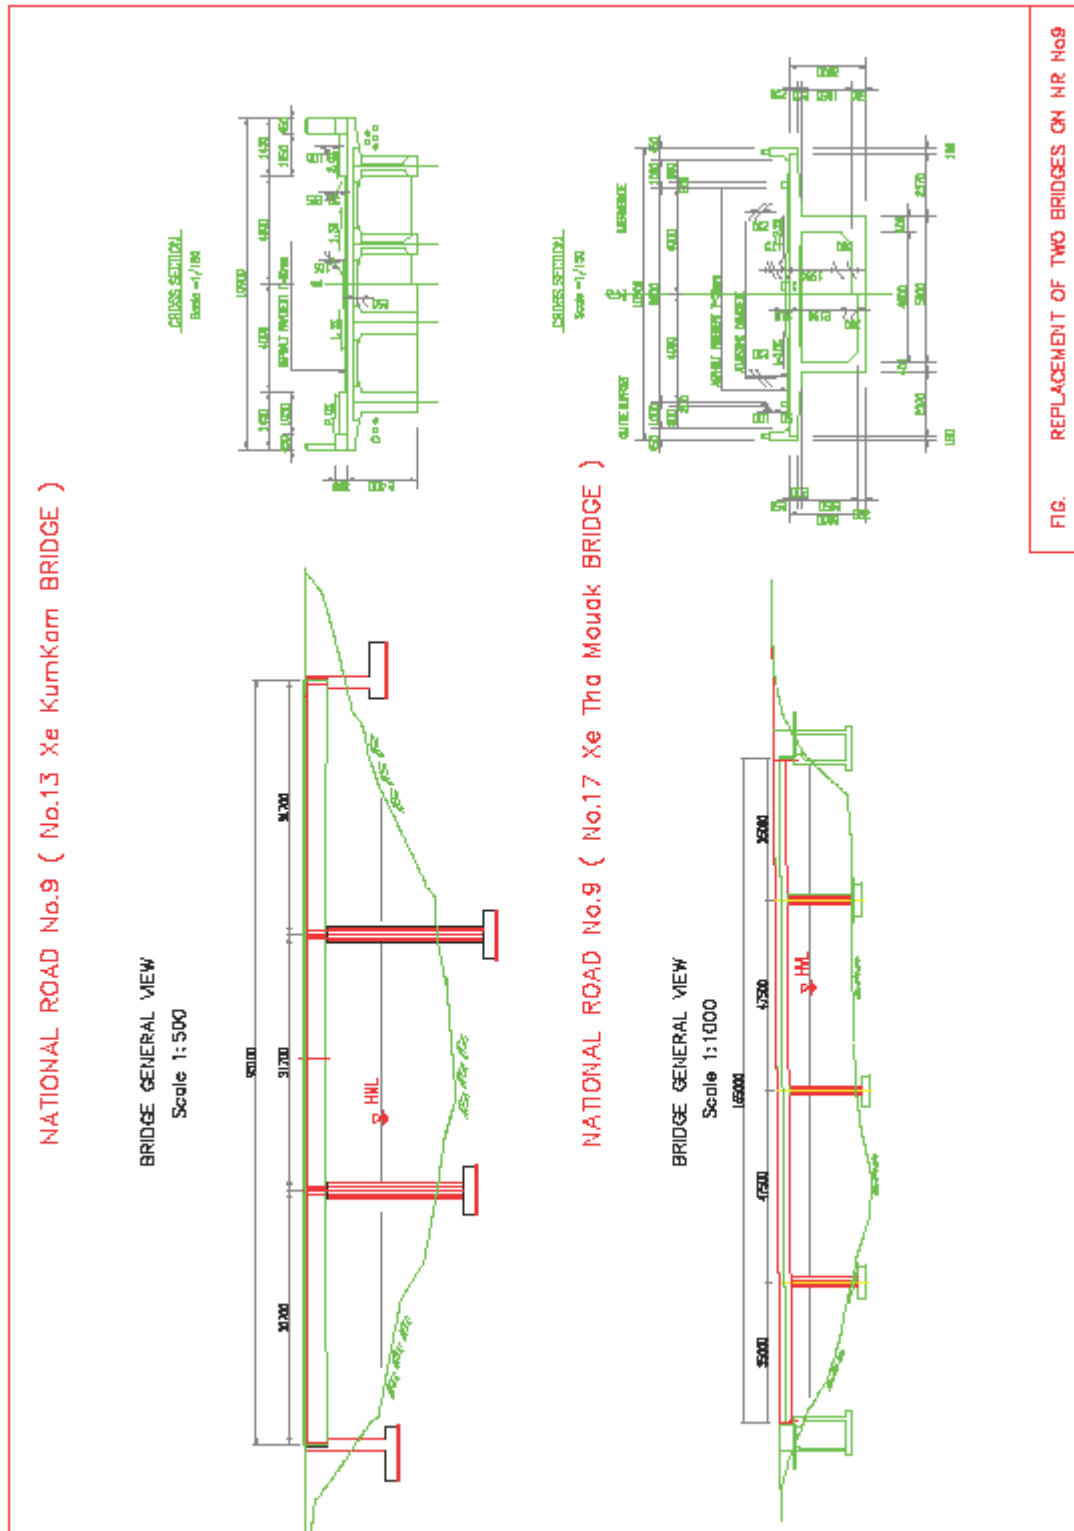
Plan and Profile (Replacement of Bridges along NR-9)
